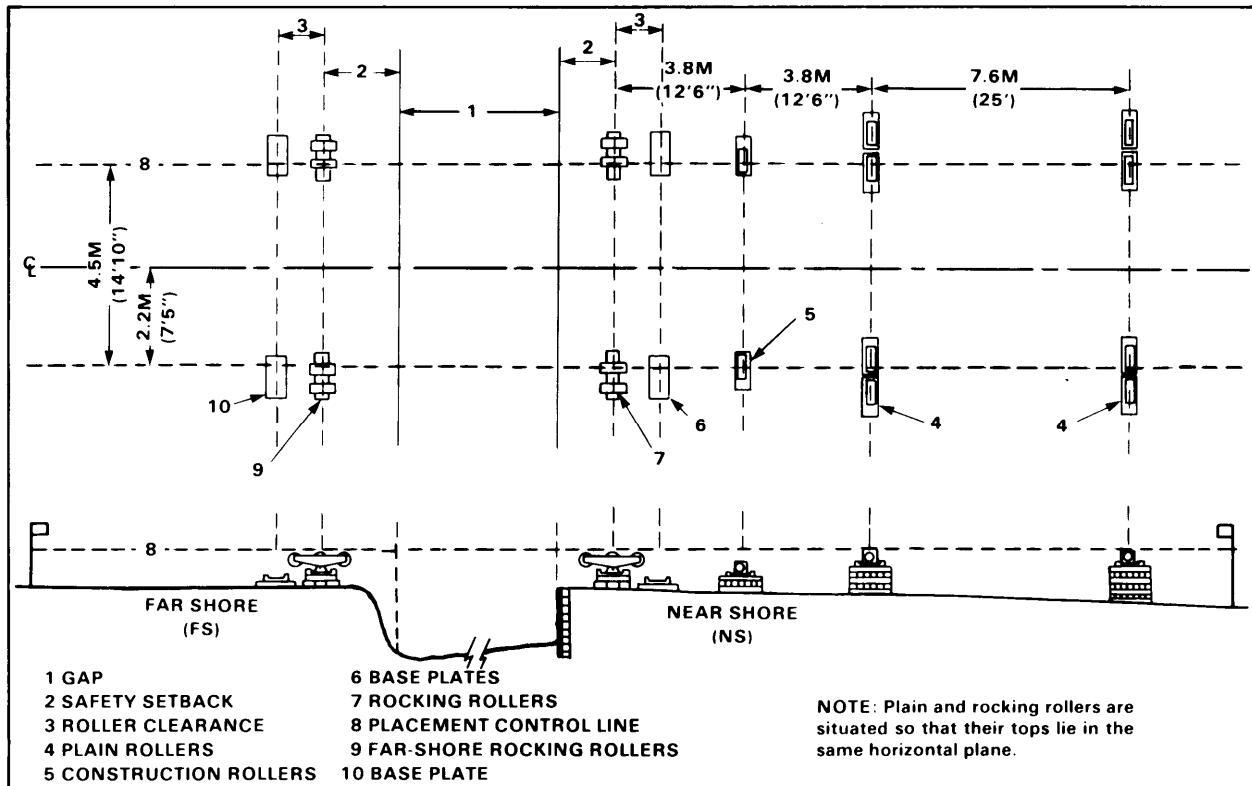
Plan and profile views of a typical roller layout for a triple-truss or multistory bridge
